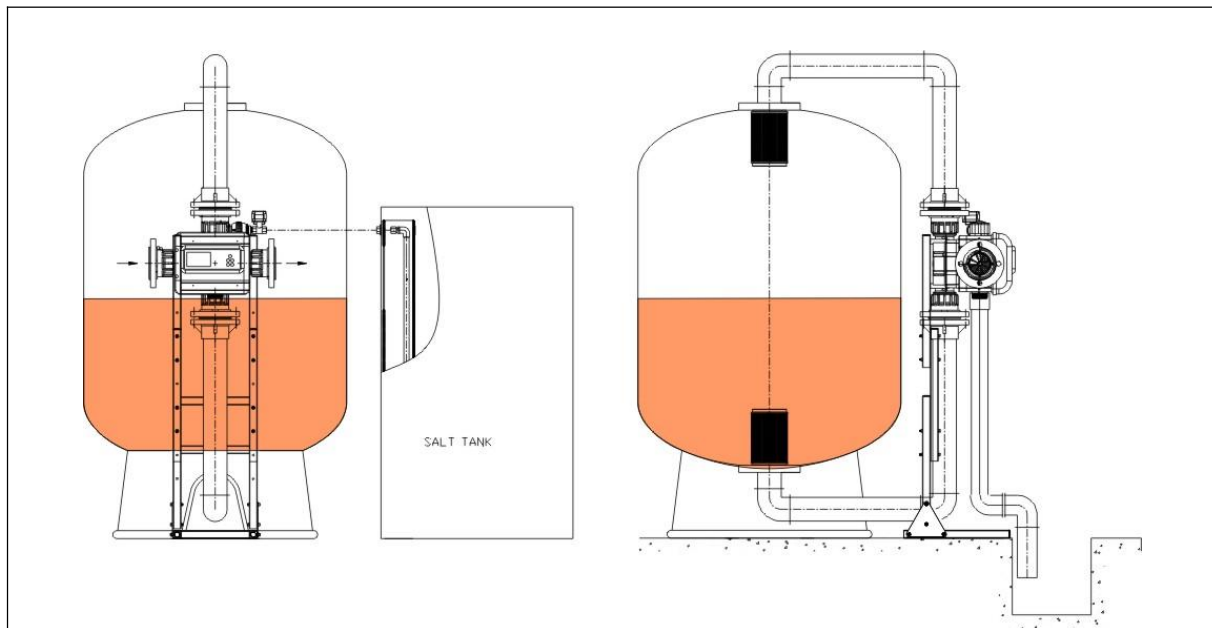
Schematic Diagram of installation of side valve Softener (GR40 valve as an example)
